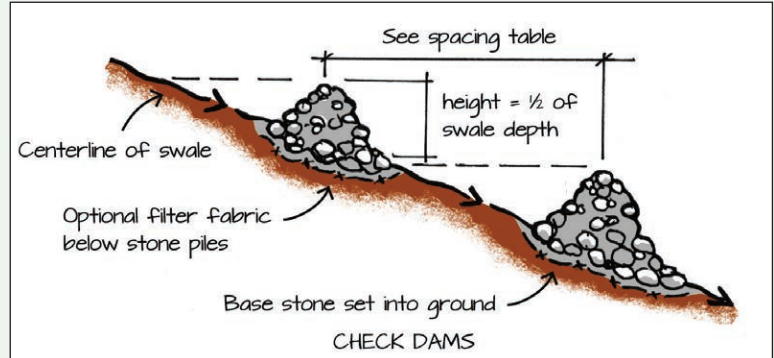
Typical design detail of a rock check dam for roadside ditch projects.
